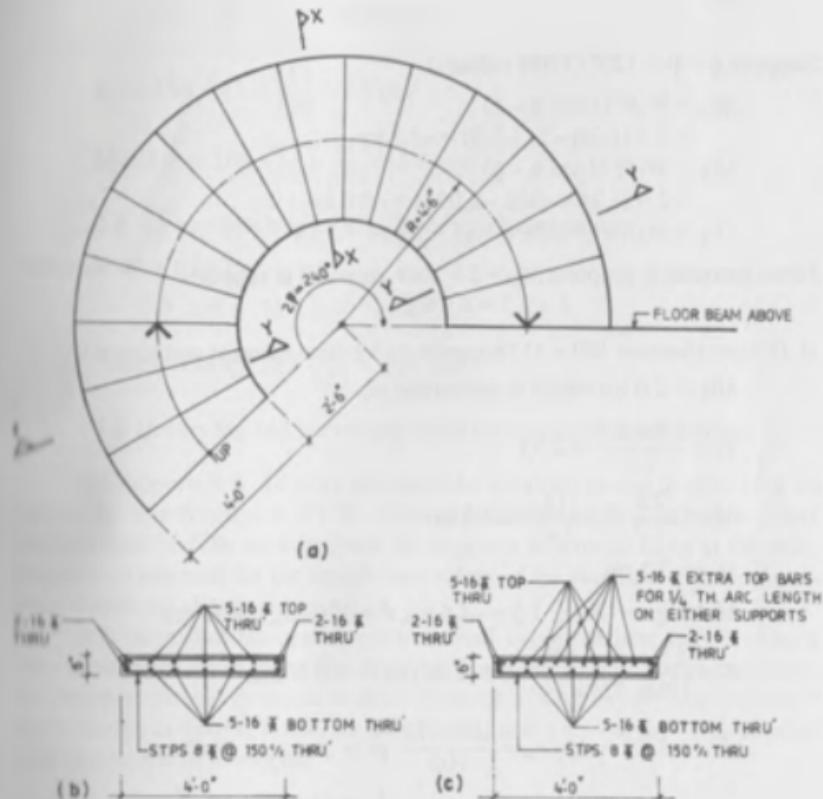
A. Details of helicoidal stairs of Example 4.6.1. (a) Plan of helicoidal stairs; (b) Section X-X (midspan); (c) Section Y-Y (support TS).
